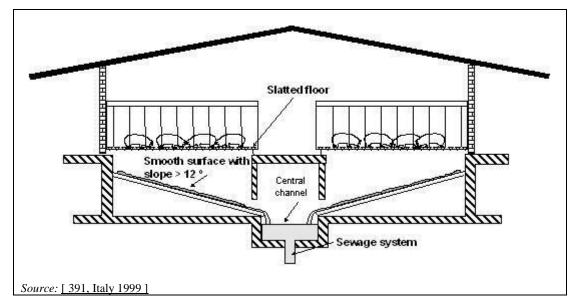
Flat decks or pens with an underground concrete slope to separate faeces from urine
